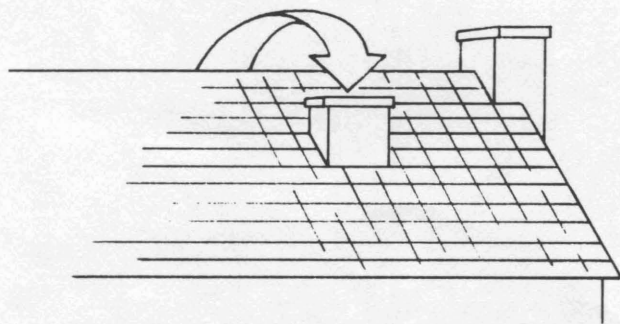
Chimney should extend at least 2-3 feet above the roof. Chimney at left is placed incorrectly. Chimney at right shows proper construction.
